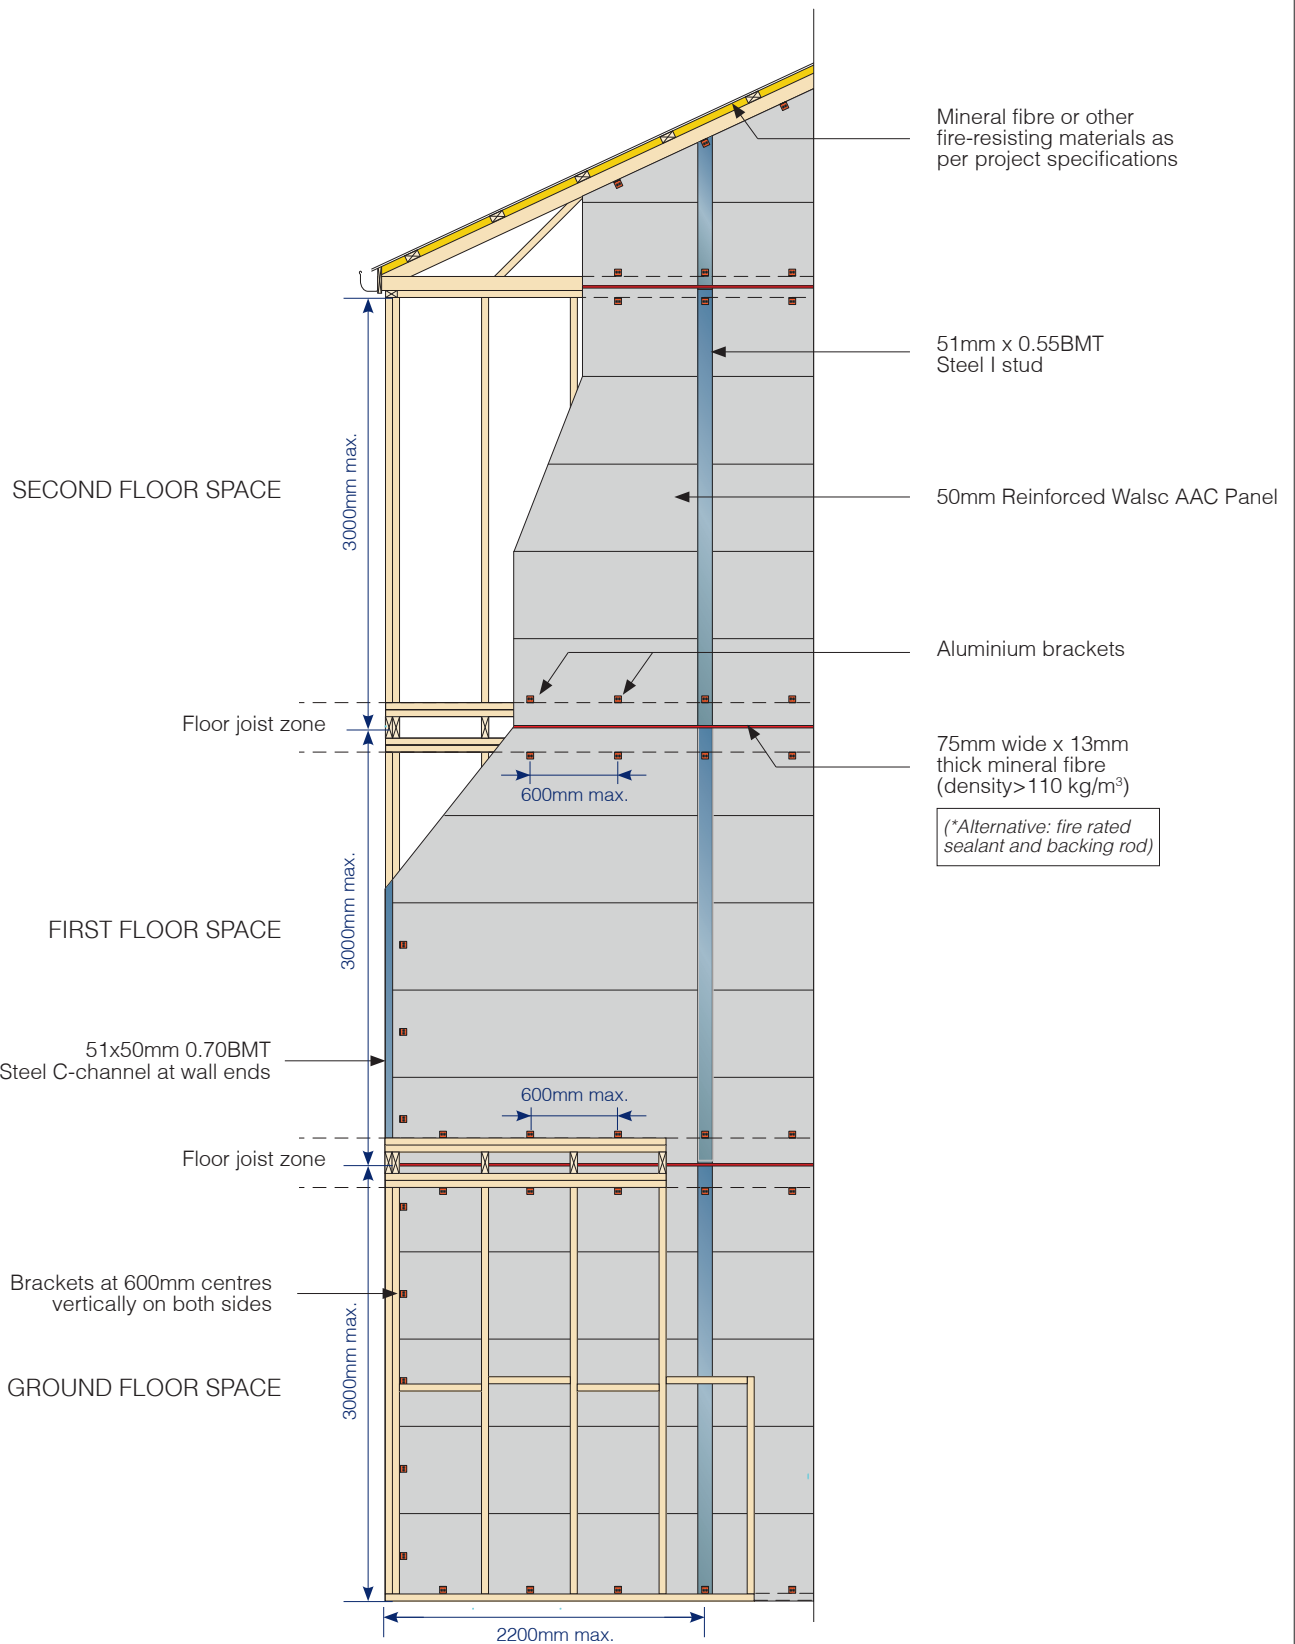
Horizontally Aligned System Panel Orientation Elevation with Inter-storey Junction Detail
